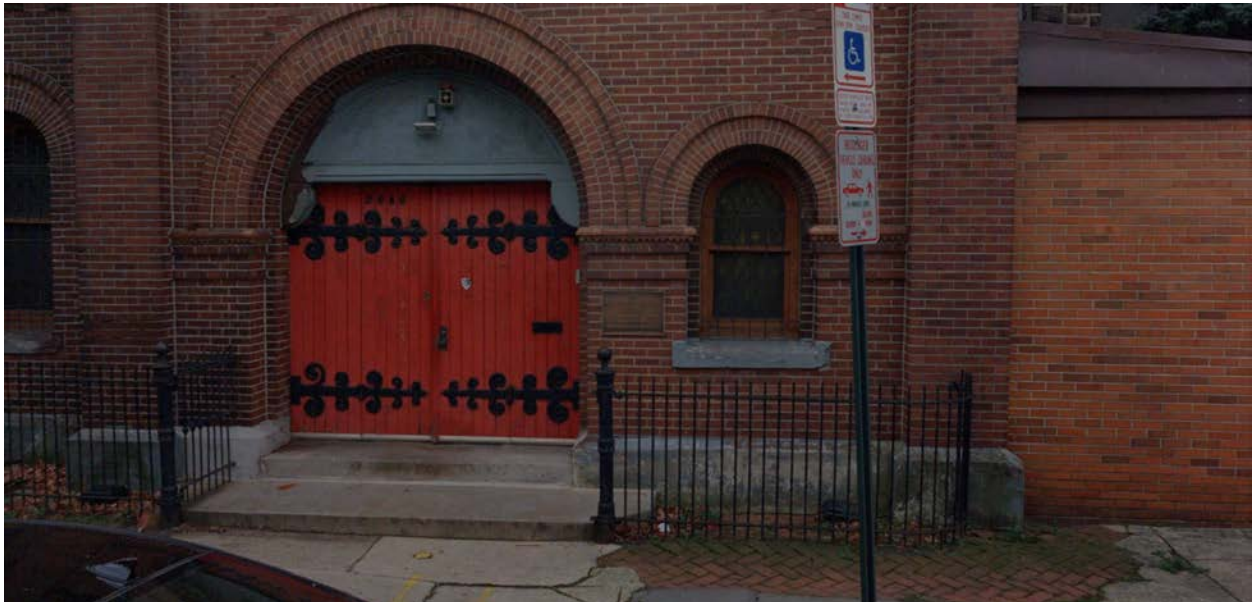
Proposed location of ADA ramp at Richard Newton Memorial Building.
